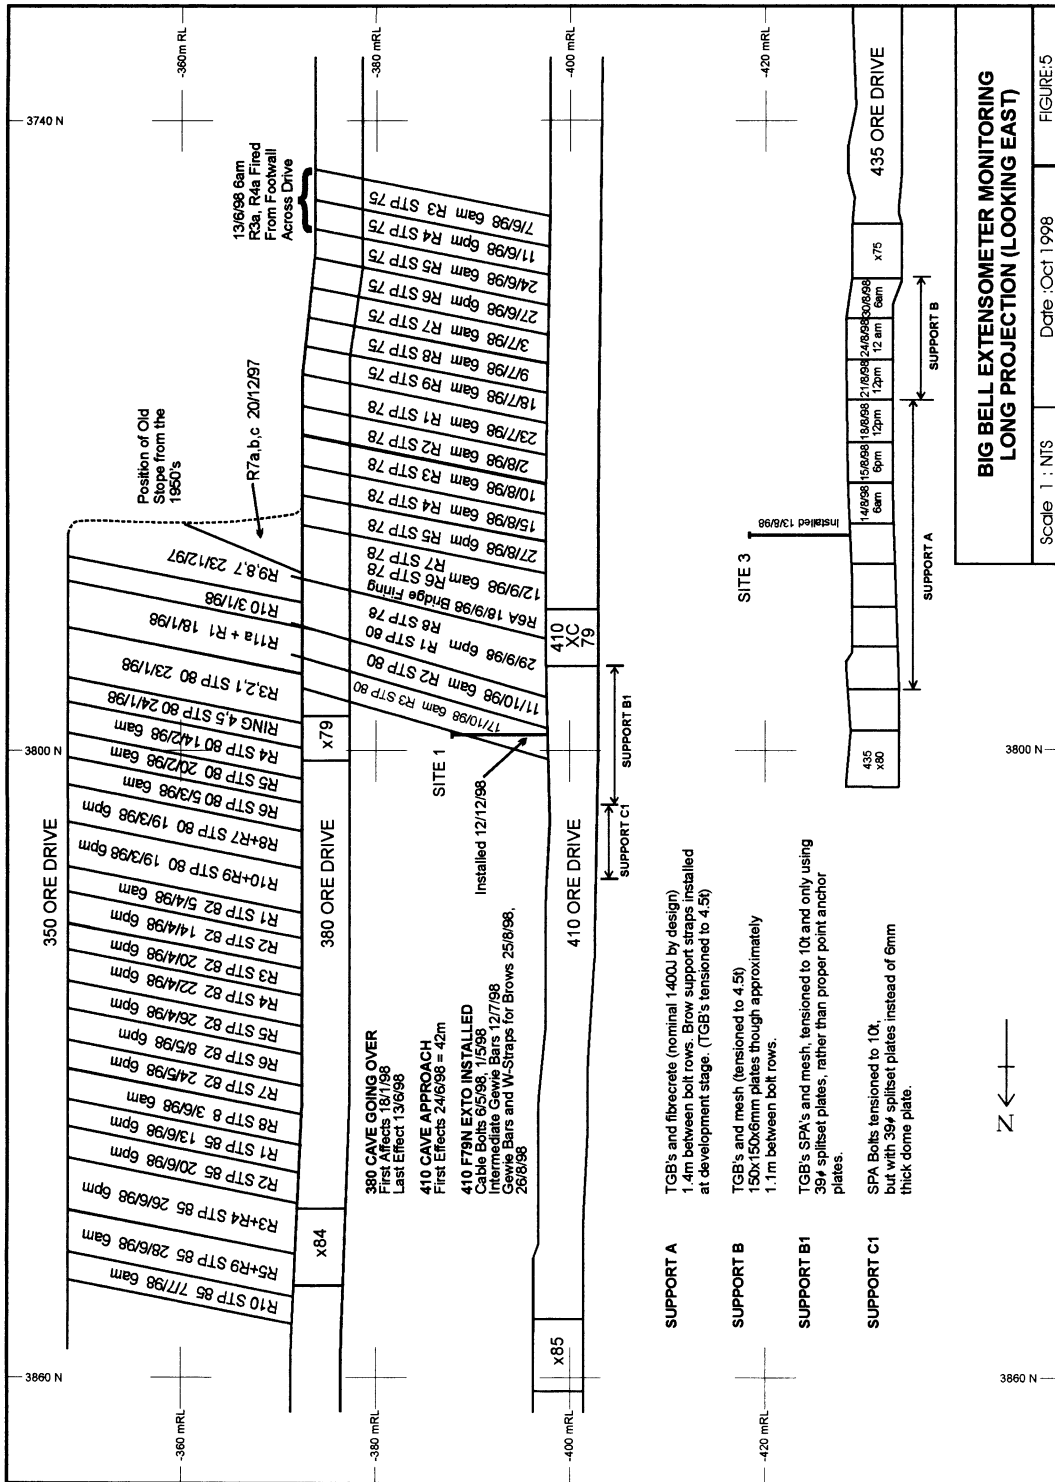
Long projection at extensometer sites 1 and 3 looking to the east.
